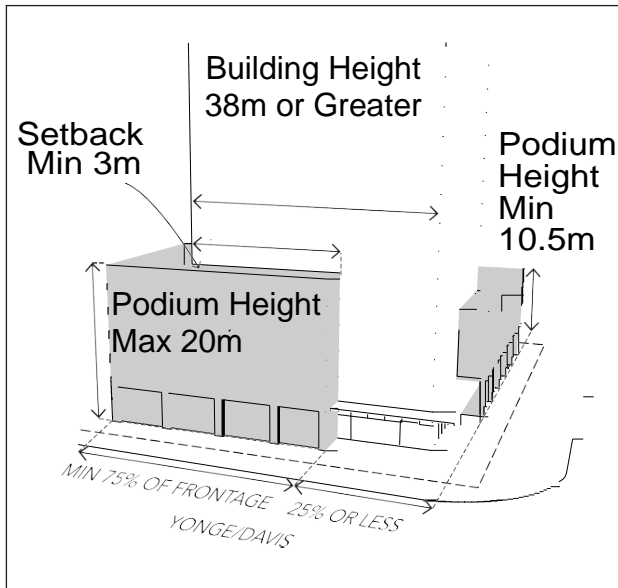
Podium Street Frontage, Minimum and Maximum Height and Setback for Buildings 38 metres or more.
